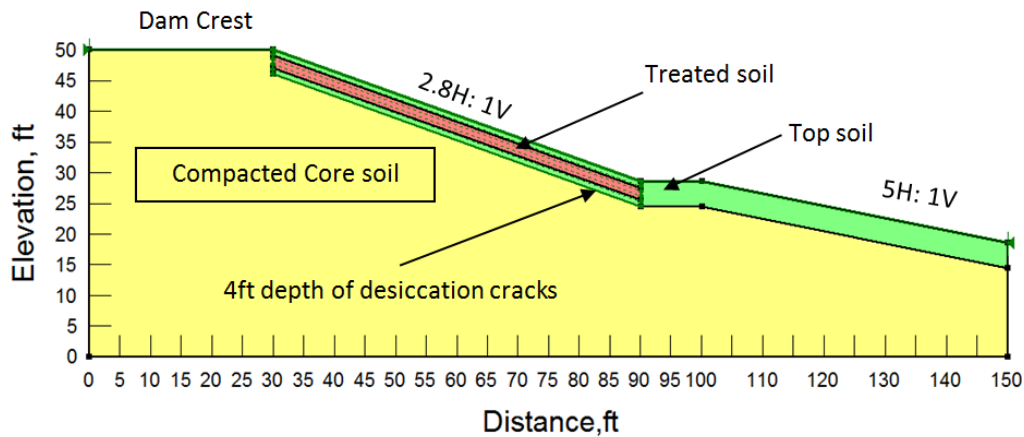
Cross-section of Joe Pool Dam modeled in SLOPE/W (Le, 2013)
